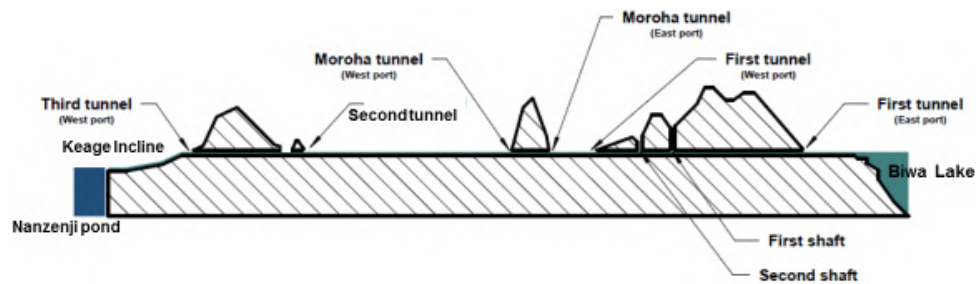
Lake Biwa Canal: longitudinal section of the First Canal (by author).
